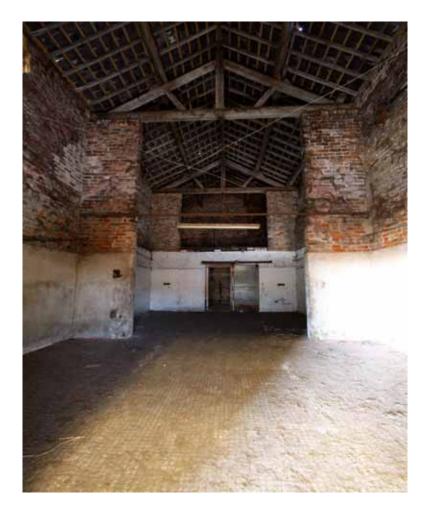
Open interior of the barn (Building 1) showing king-post trusses supported on brick buttresses
